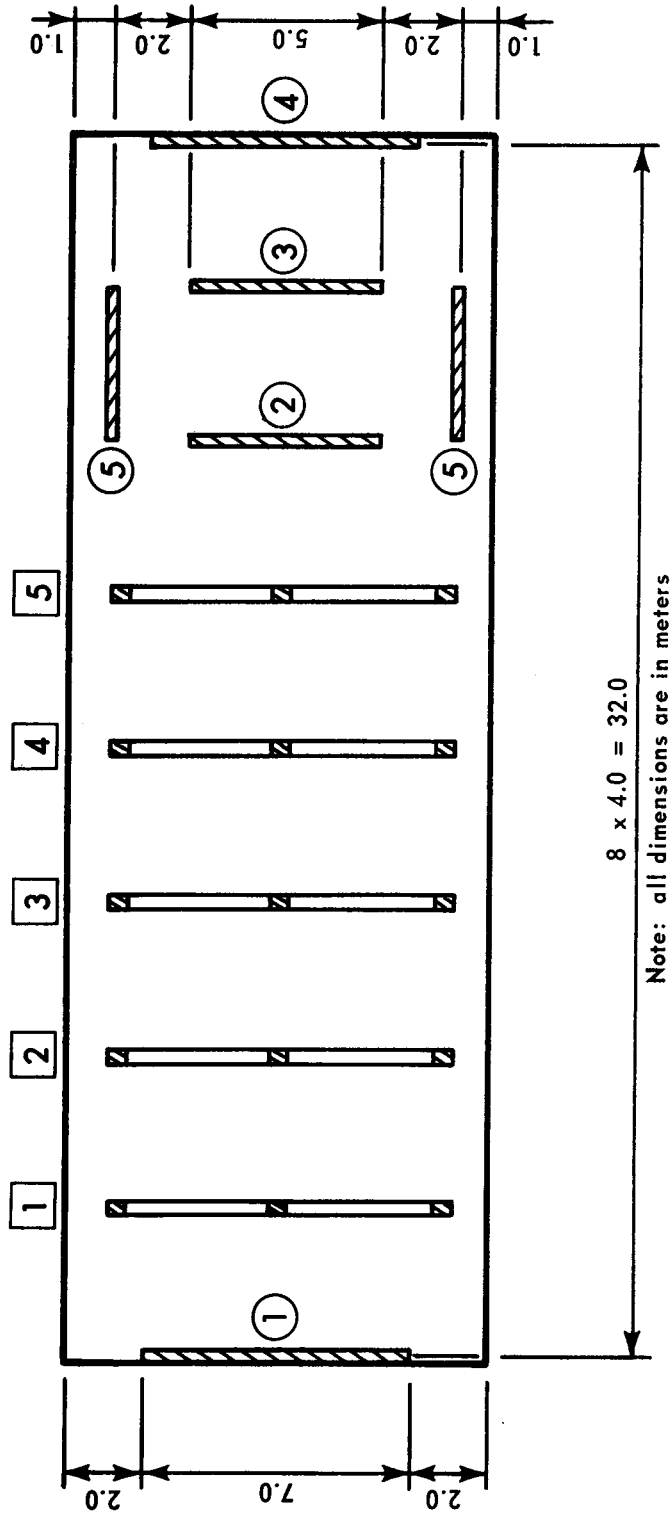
PLAN SIXTEEN STORY STRUCTURE
